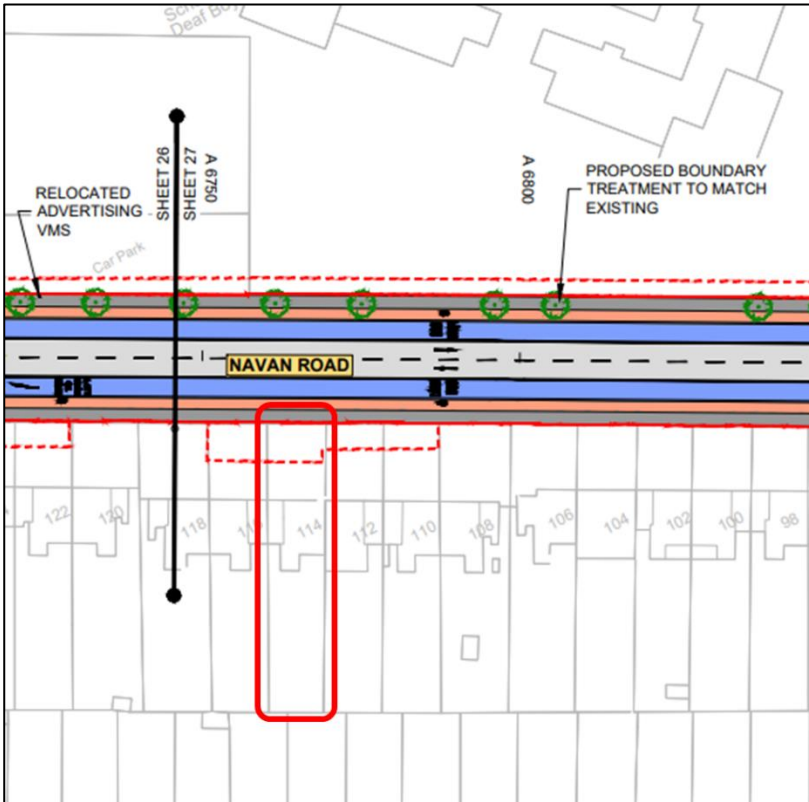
Proposed new Layout at 114 Navan Road
